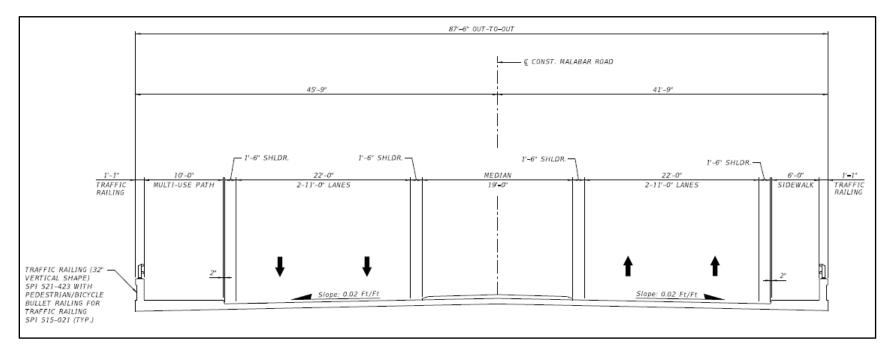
Canal C-10 Bridge – Alternative B Desired Right-of-Way and Raised Sidewalk
